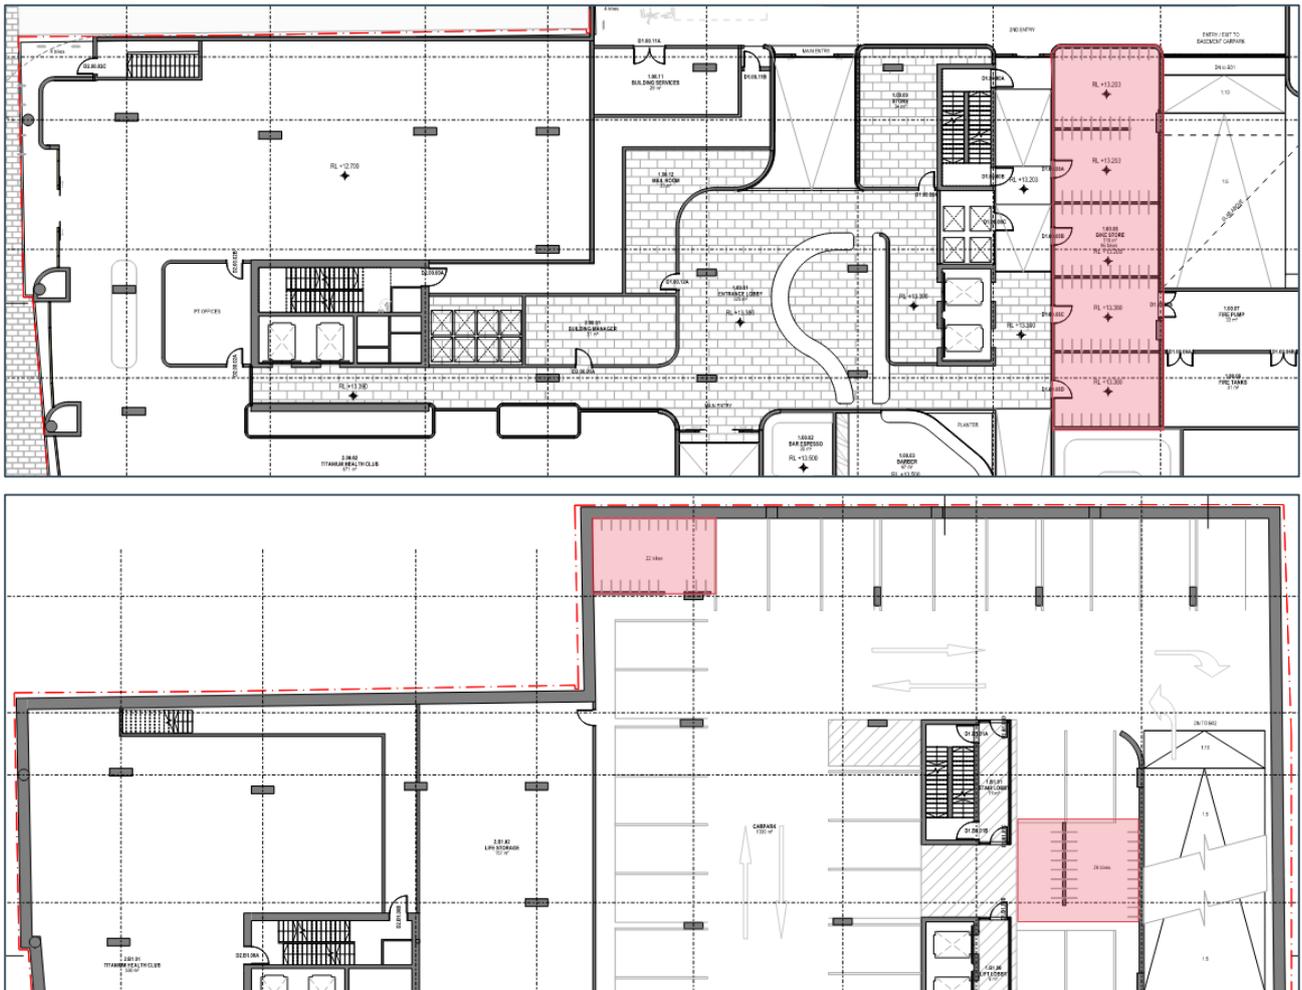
Bike parking facilities; ground floor (top), basement levels (bottom)
